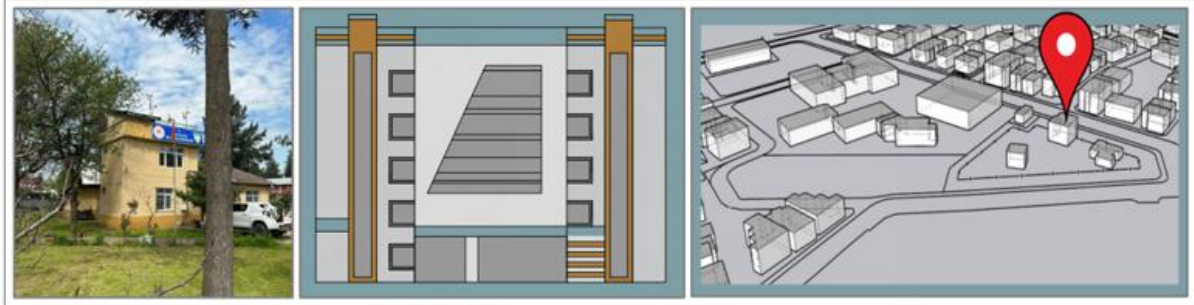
The building of Düzce Governorship Meteorology Directorate, located in the Uzun Mustafa neighborhood of the study area Düzce, the facade design proposal of the building and its location
